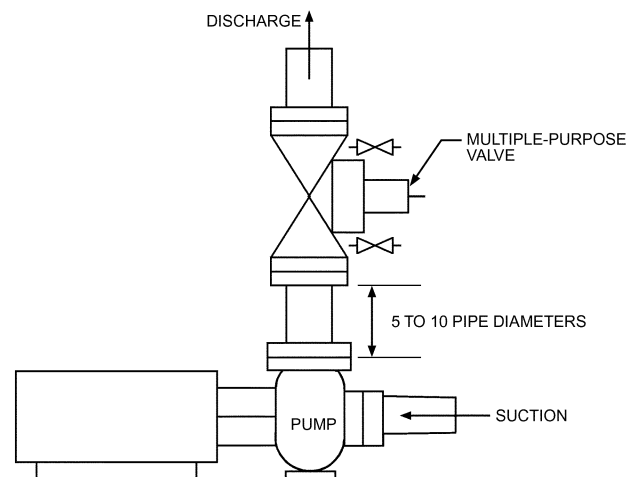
Typical Multiple-Purpose Valve (Straight Pattern) on Discharge of Pump
